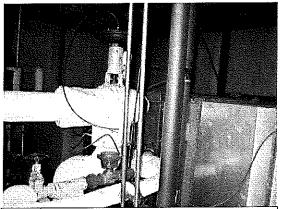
Photo HVAC vault on the roof — note suspect #9: ACM in the form of mudded pipe insulation
